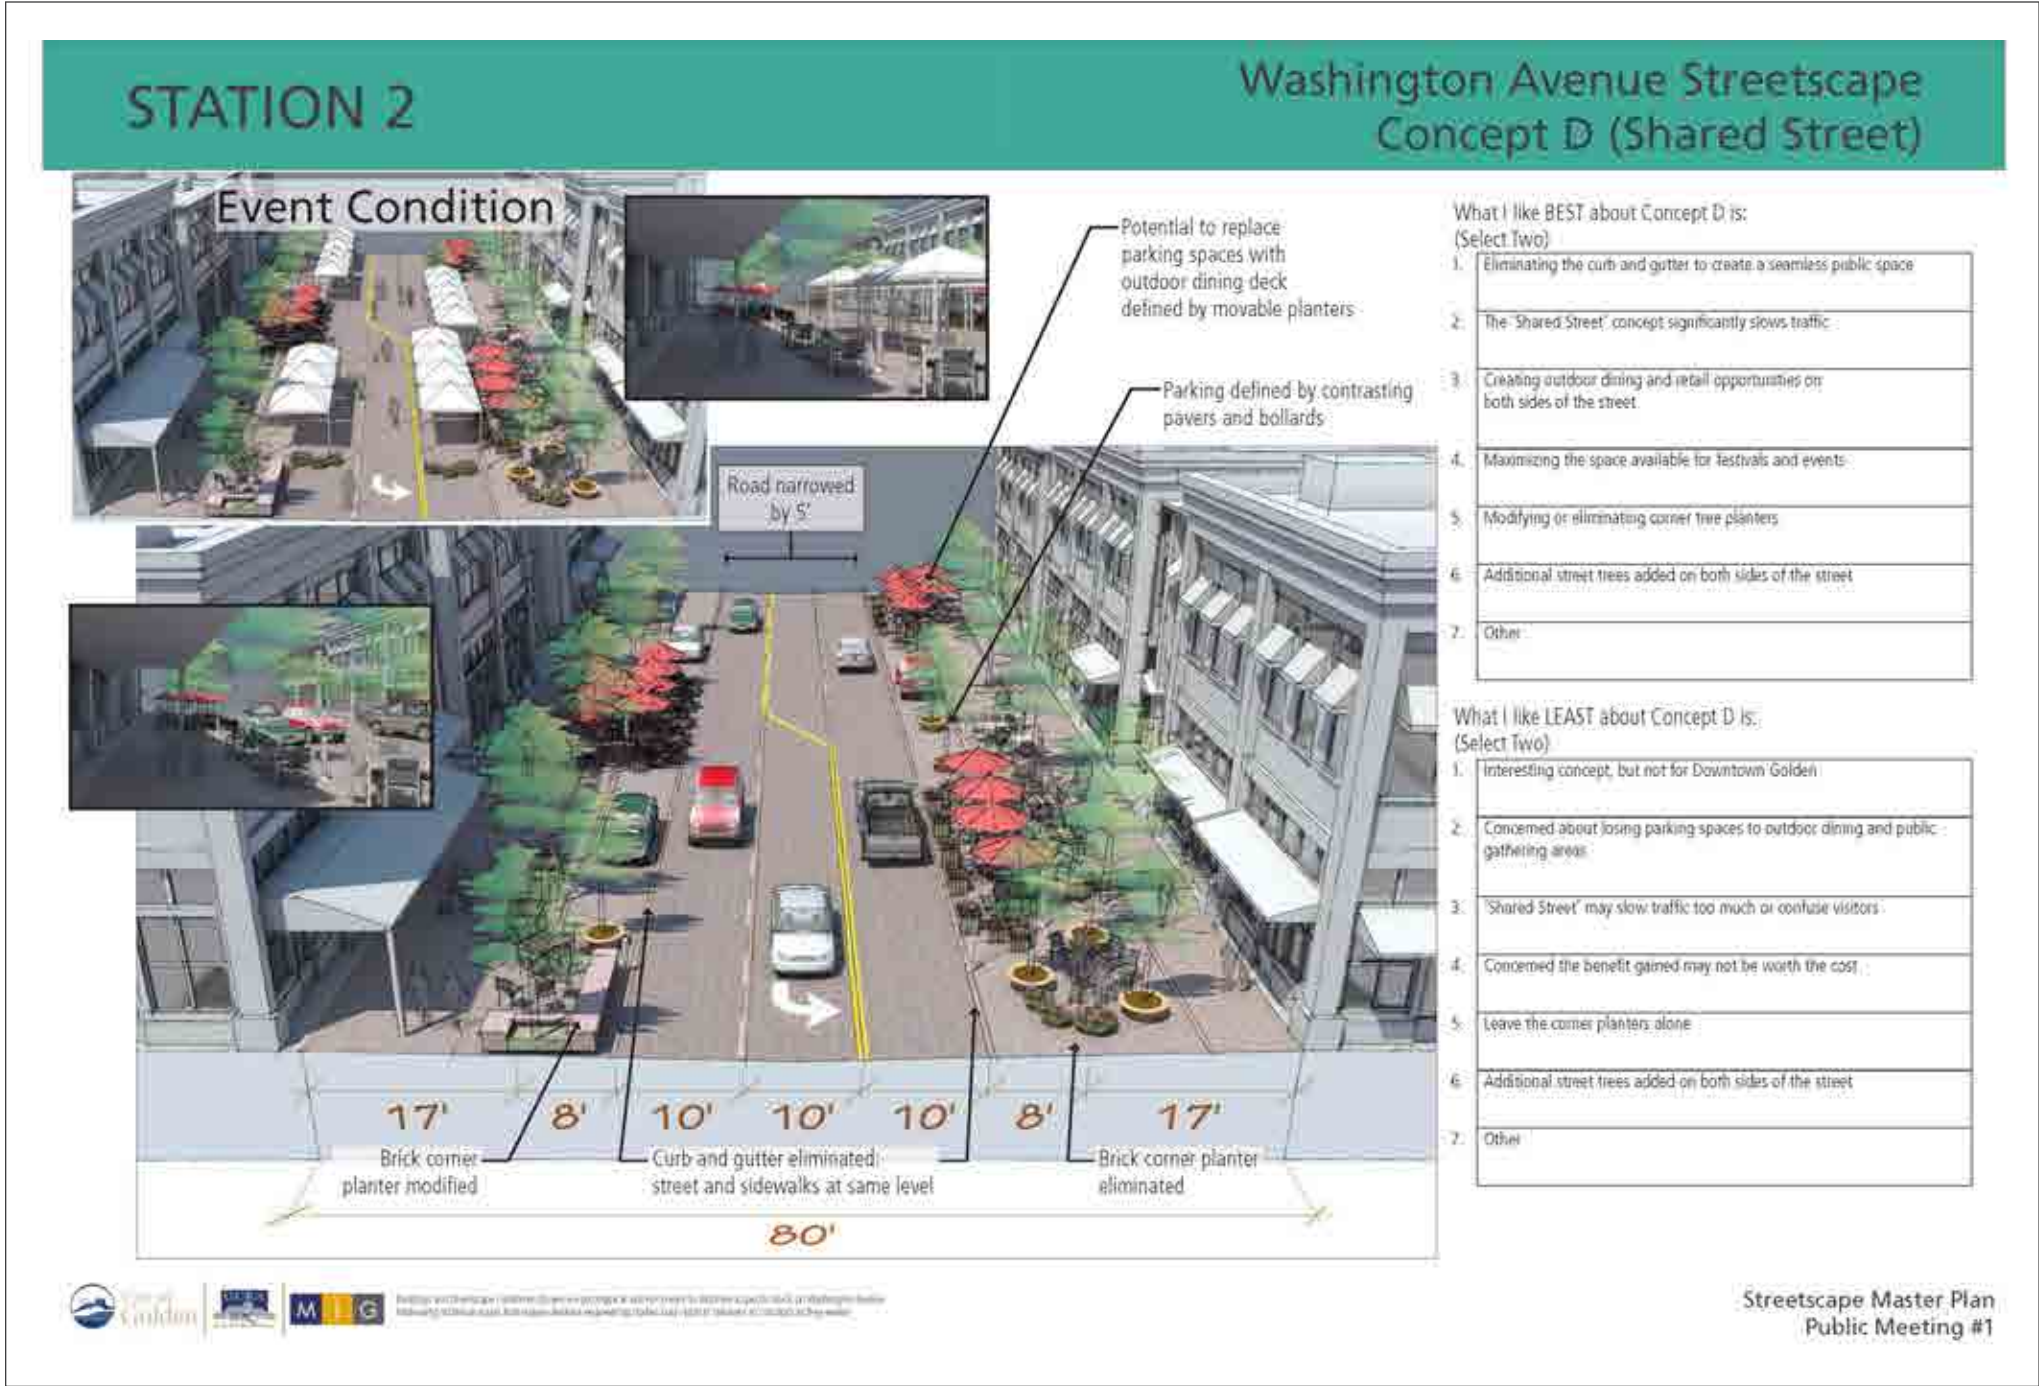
One of the posters used at the July open house illustrating the shared street concept
